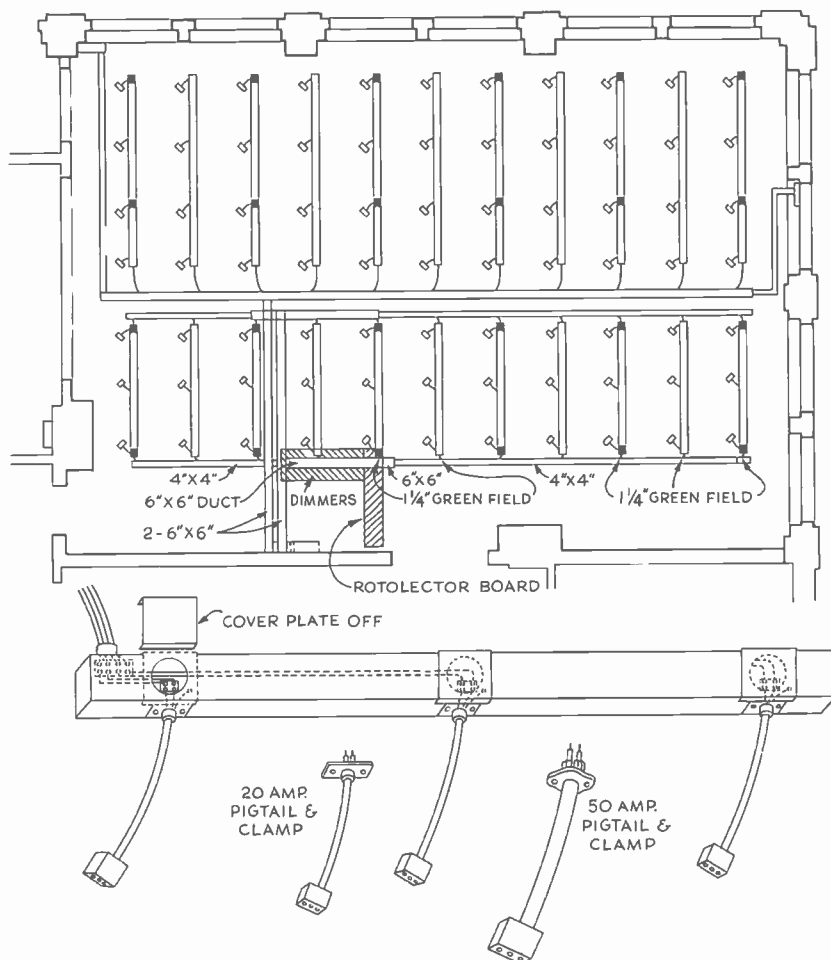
Lighting plan of one of WBKB studios. Detail in the lower third of this drawing shows how a 50-amp pigtail can replace a 20-amp in the connector strip. Note that each pigtail has its own terminal block and access plate. In this installation every lighting unit is equipped with its own pantograph hanger to provide individual height adjustment from the fixed pipe grid.
